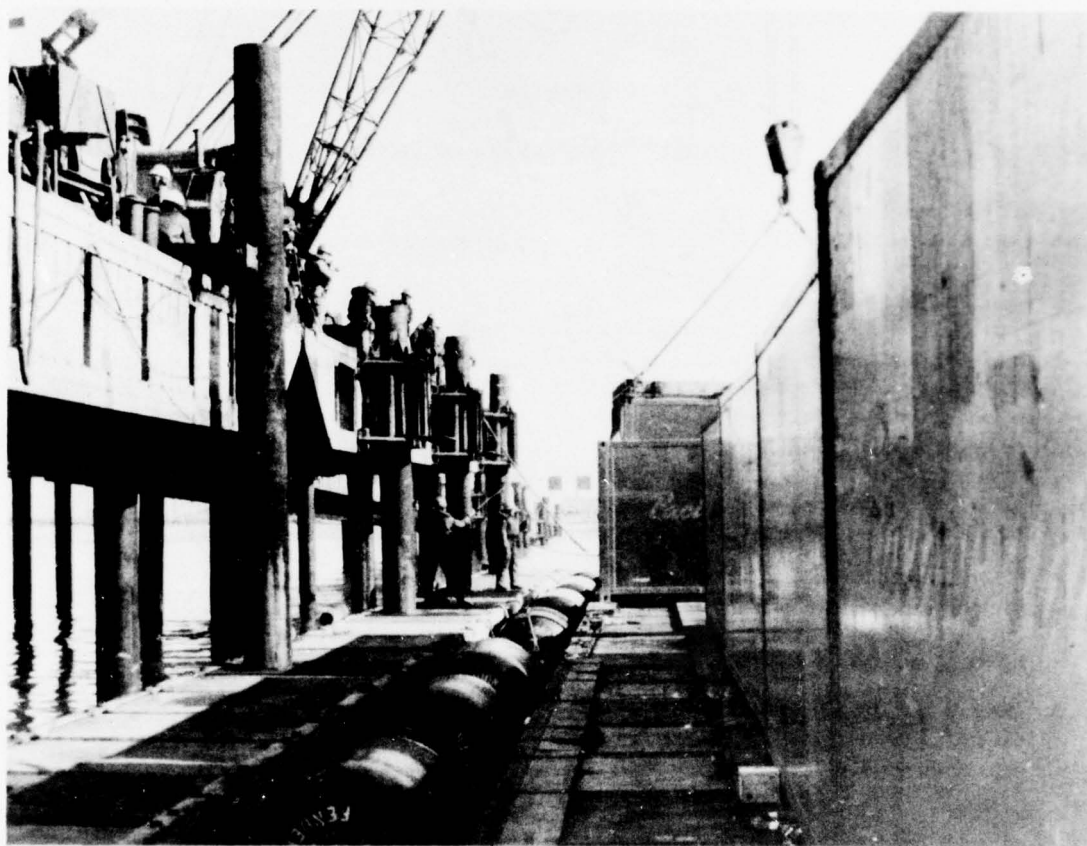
Off-loading containers from floating causeway sections alongside elevated causeway.
